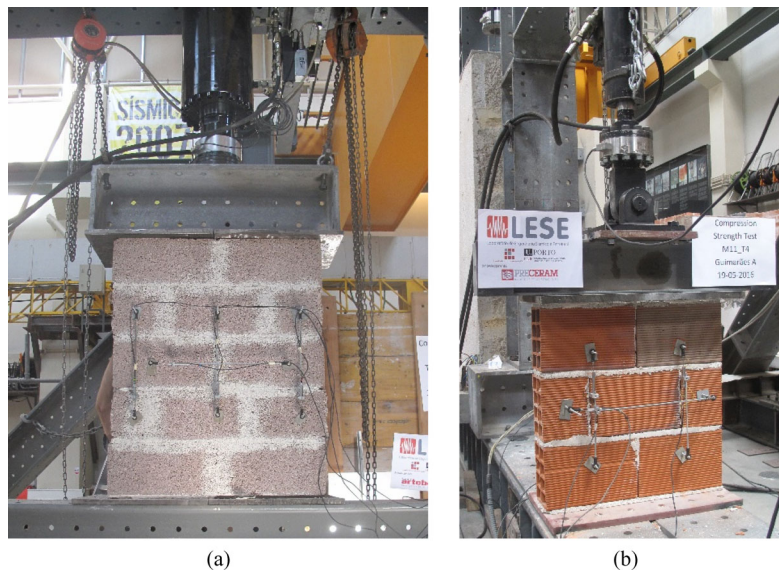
Compressive strength tests: (a) test setup specimens made with VHCB315 masonry units; (b) specimens made with HCHB masonry units.
